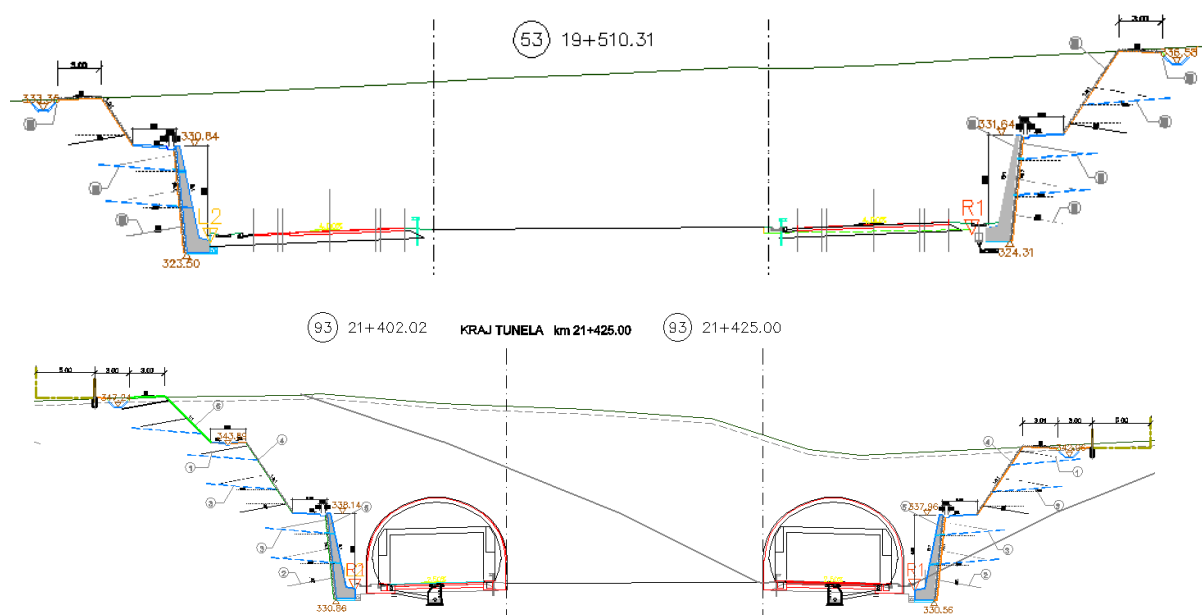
View of principal rock cut stabilization measure by applying regular anchoring, placing of steel wire mesh, and geo-mats
